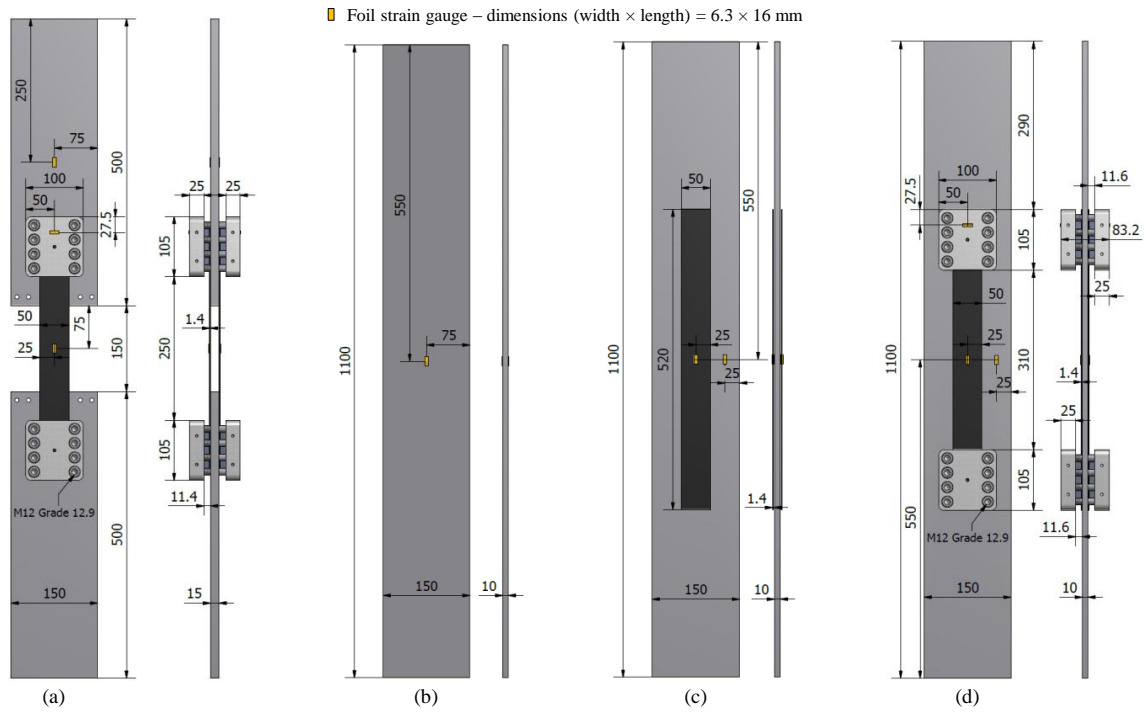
Dimensions of different test specimens and locations of the mounted strain gauges (all dimensions are in mm): (a) clamp test; (b) reference; (c) NPBR-NM, NPBR-UHM, and PBR-NM; (d) NPUR-NM, and PUR-NM.
